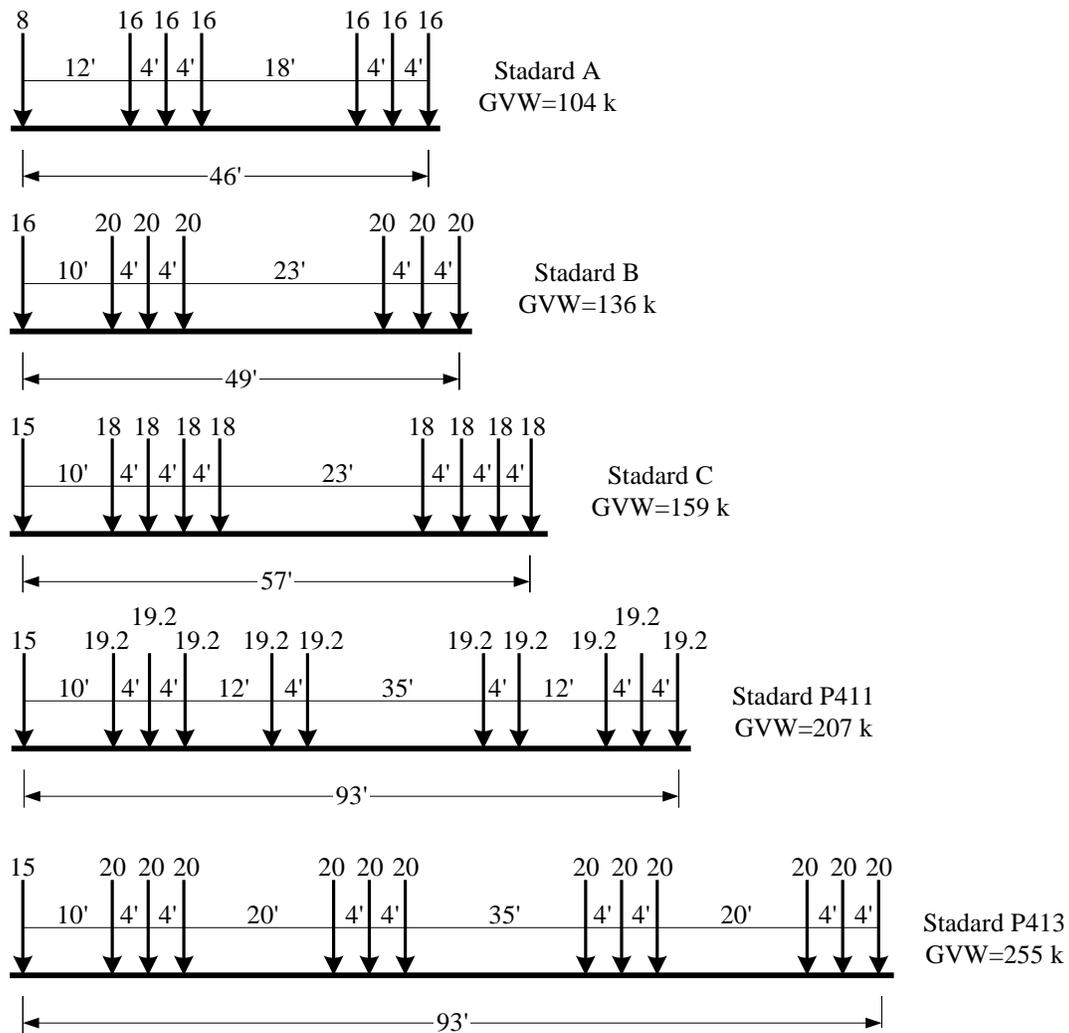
Standard Mn/DOT Overload Permit Trucks
